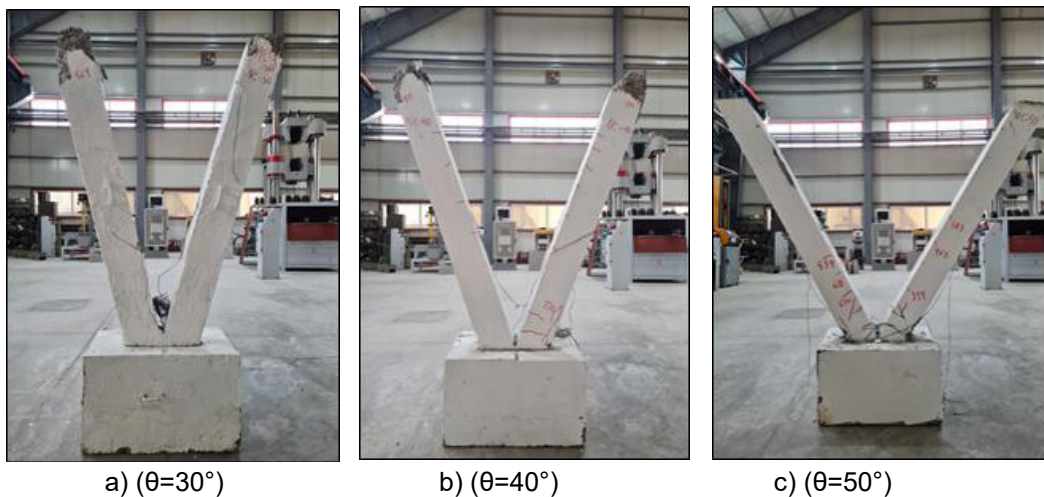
Damage development for V-shaped normal concrete columns without tie beam.
